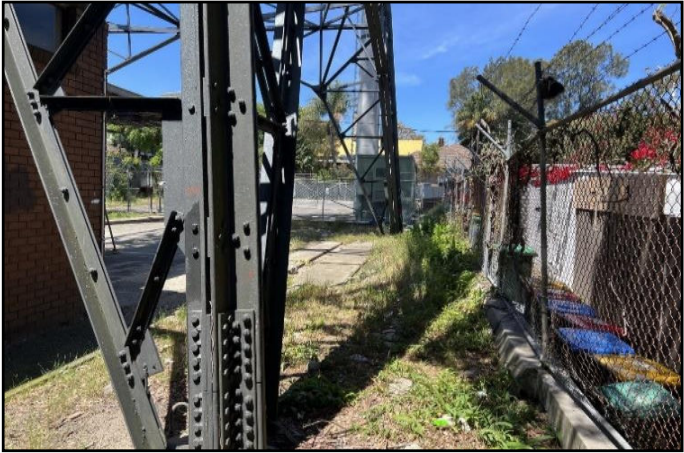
Grass area in southeastern portion on site beneath former radio transmitter tower.
